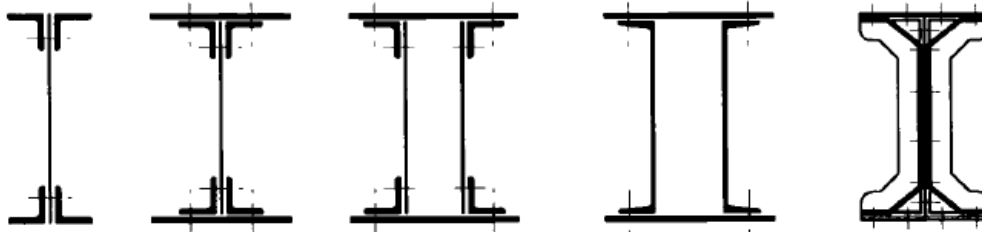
Typical cross-section of wrought iron beams and plates shows girders [4]
